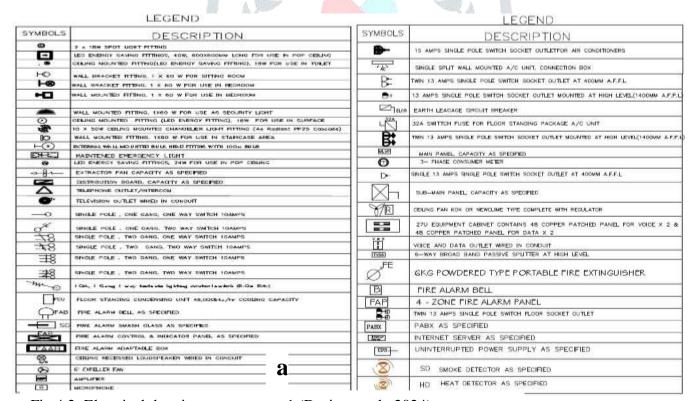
Electrical drawing components 1 (Design work, 2024)
